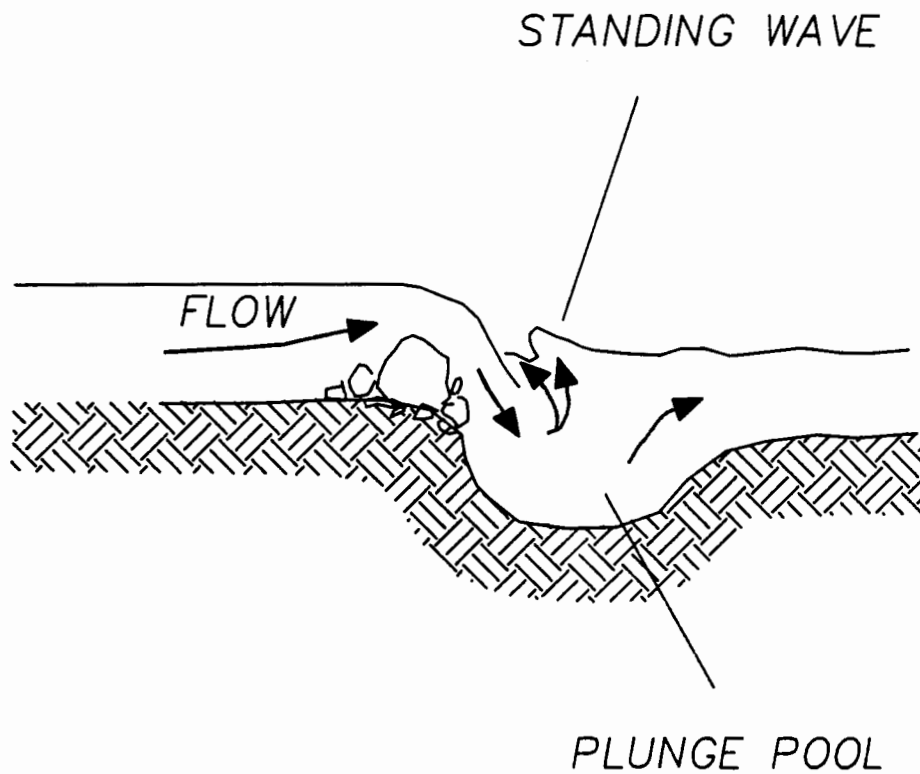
CROSS-SECTION OF A LOW HEAD BARRIER
